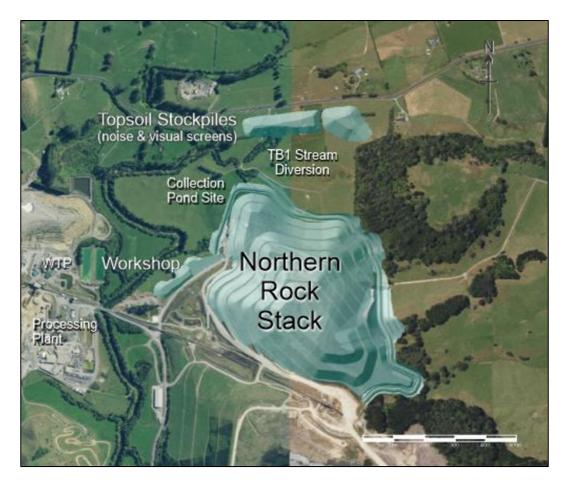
Location of Proposed Topsoil Stripping and Topsoil Stockpiles
